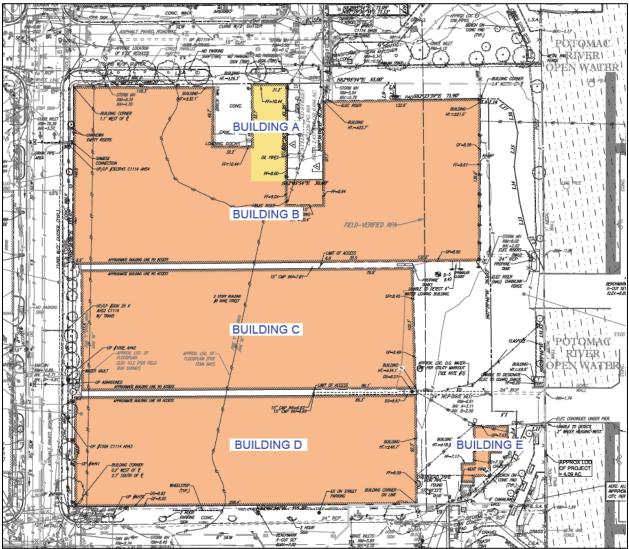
Site plan identifying Building A proposed for partial capsulation and demolition.
